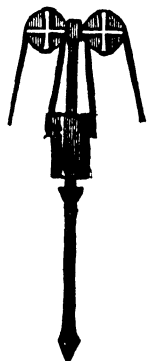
THE DRIVE-POINT AND MONKEY GEAR.
